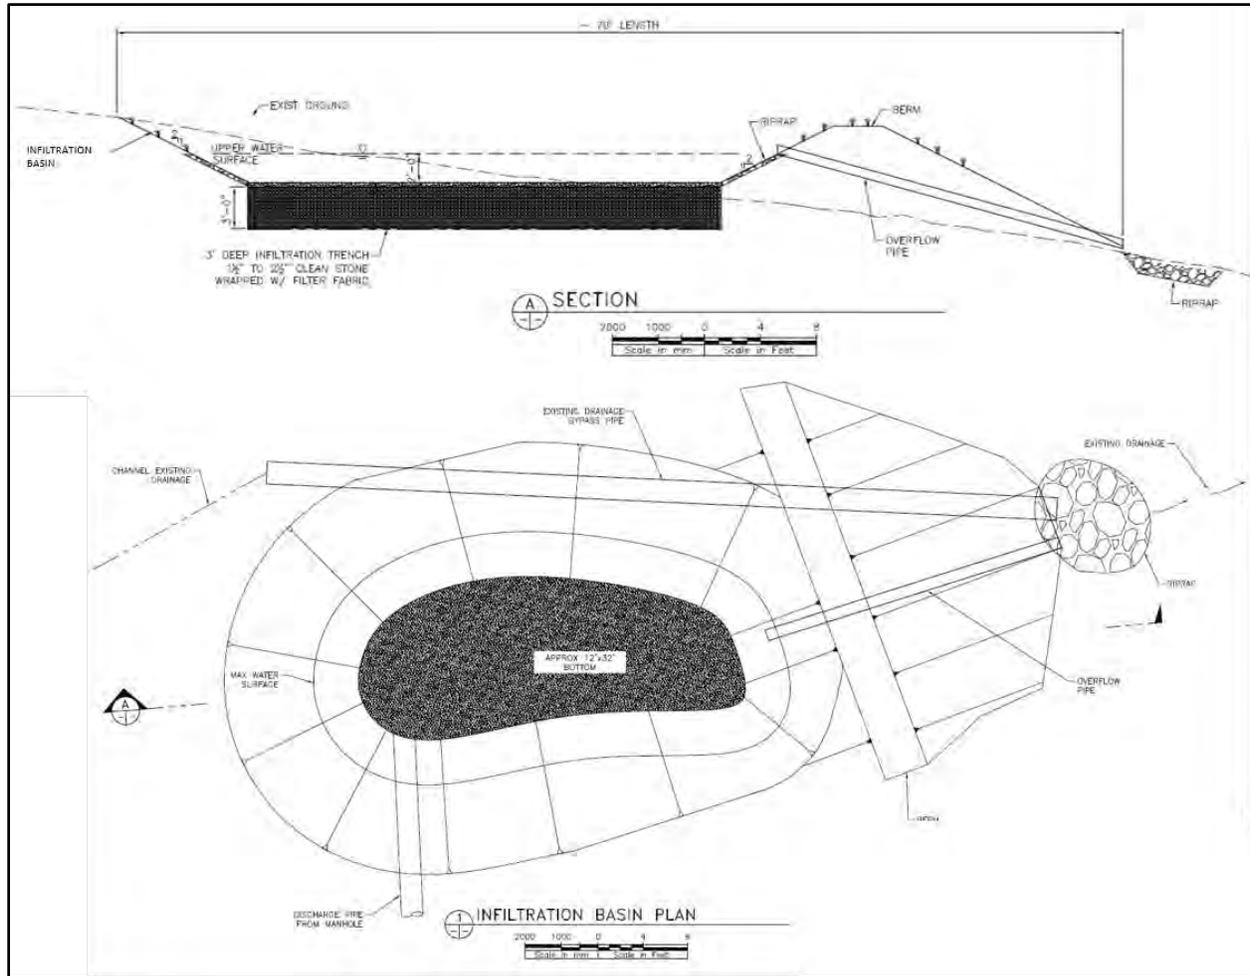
West Ravine Discharge Stormwater Infiltrations System Plan and Section
